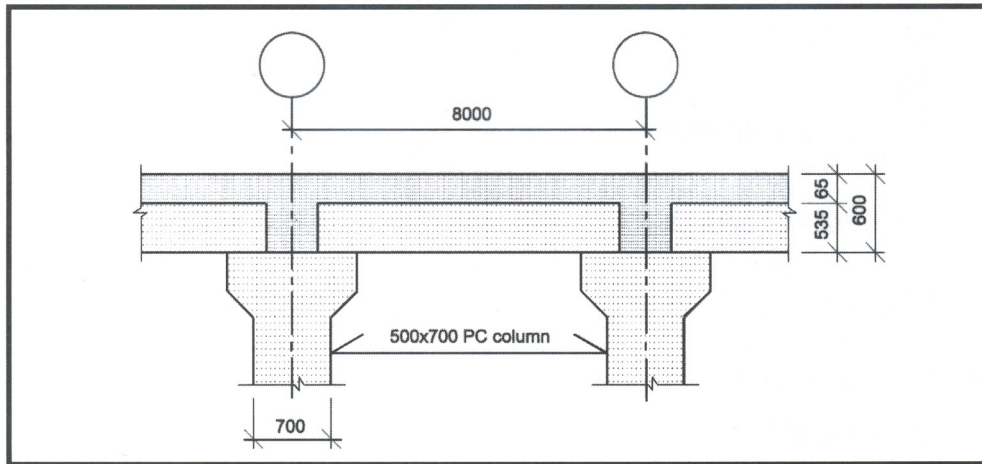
Typical Hollow Core Slabs/In-Situ Slabs Details
